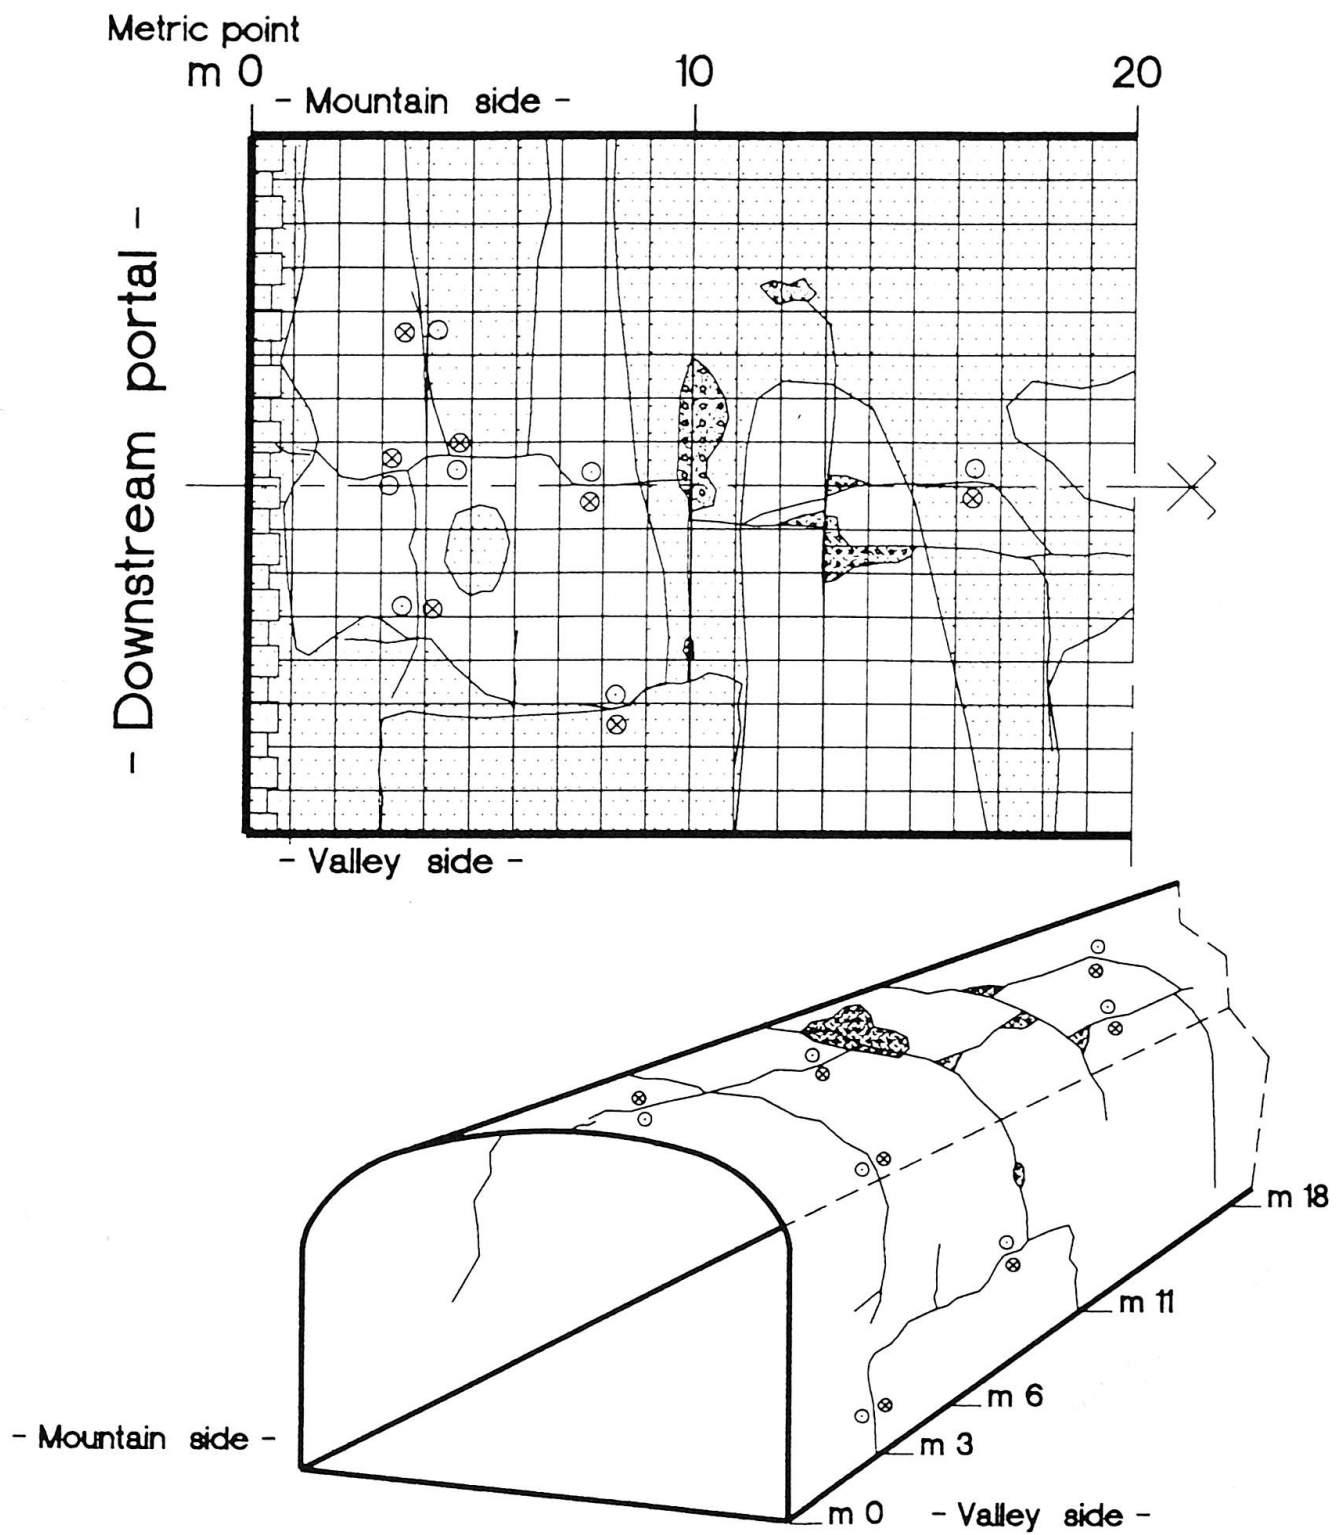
Representation of cracking affecting a concrete tunnel portal
